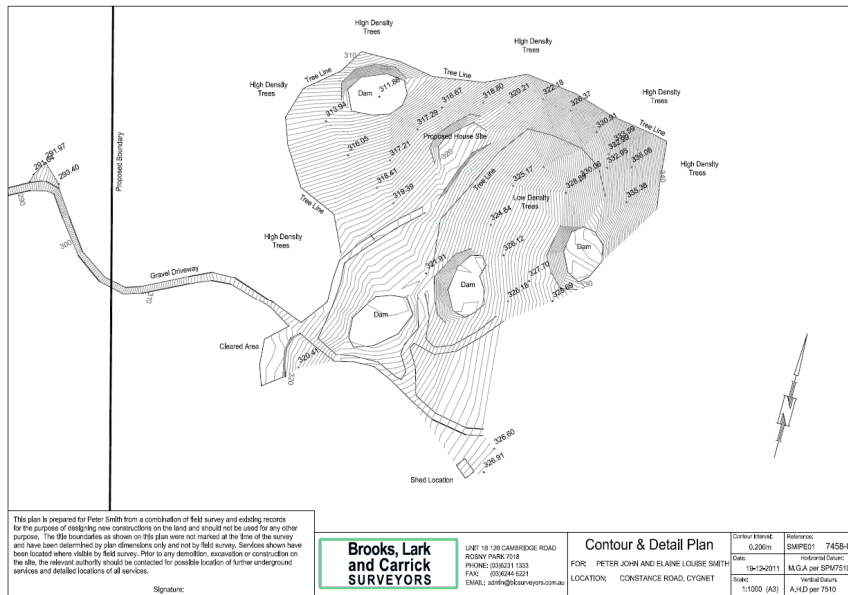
Subdivision Lot 2 Detailed contour map of site, Dams and Building envelope (2012)
